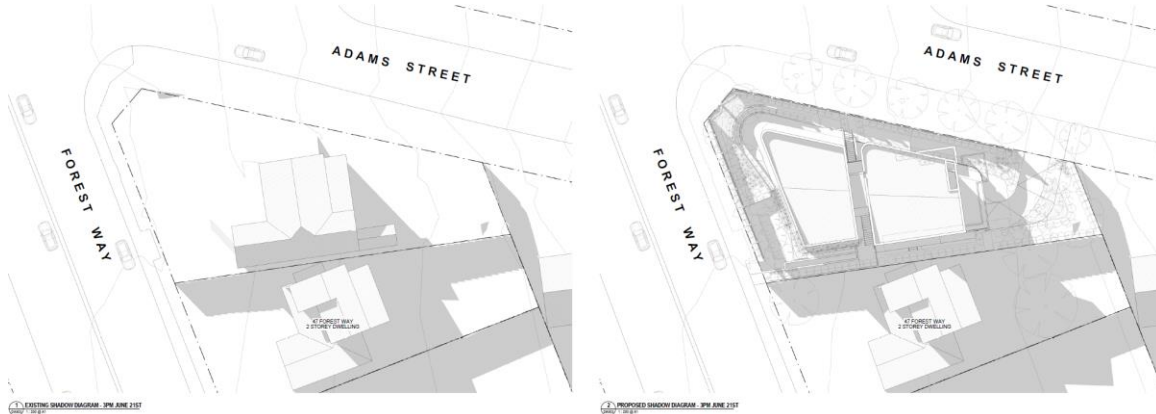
the existing and proposed shading impact to the southern adjoining development at 3pm
